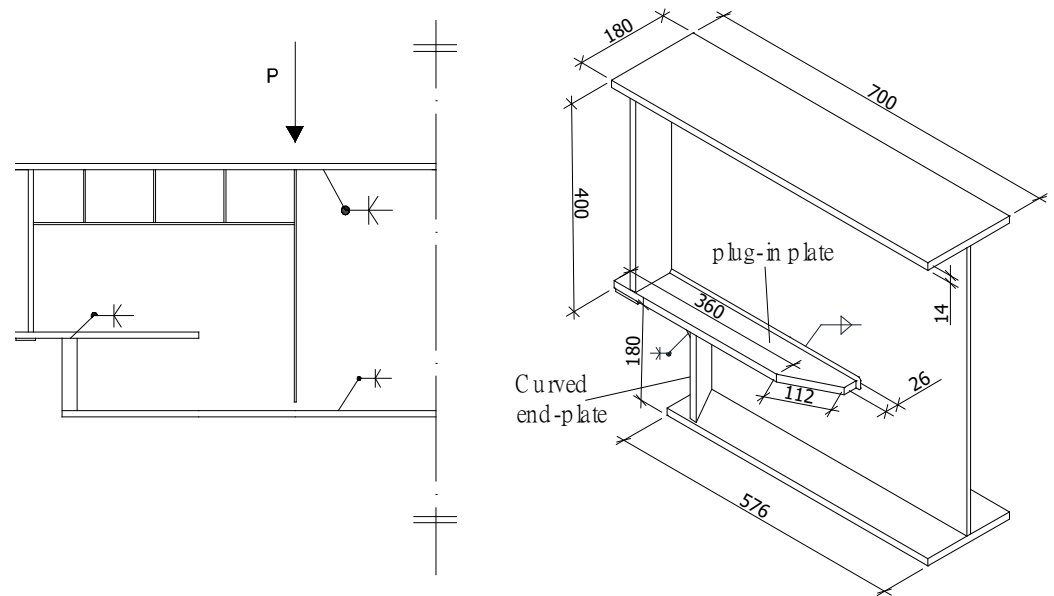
Dimensions of the variable-section support specimens with right-angle curved end plates.
